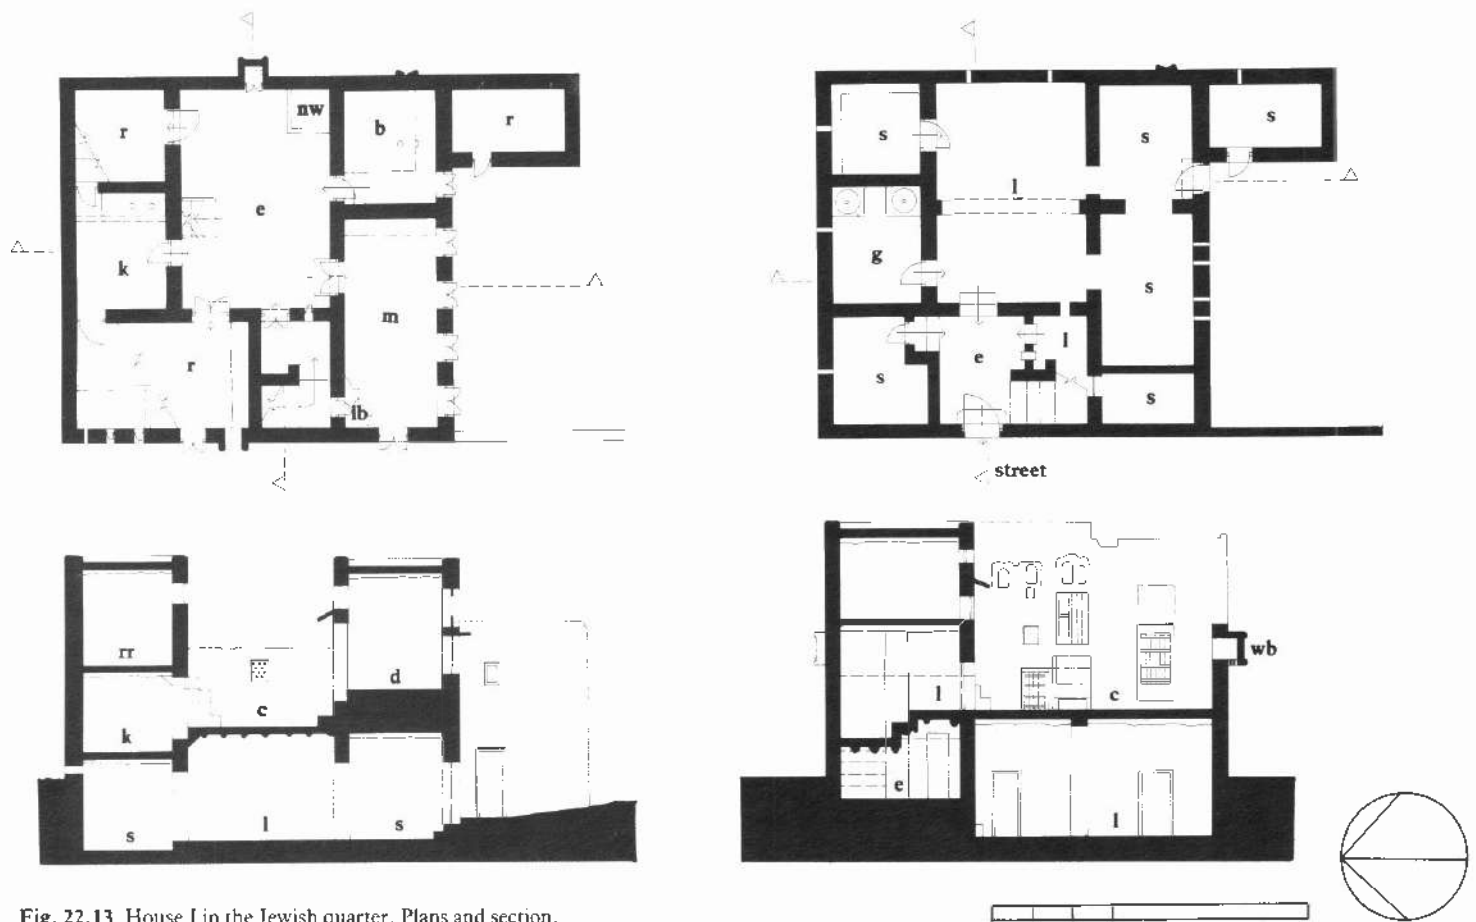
House J in the Jewish quarter. Plans and section.
